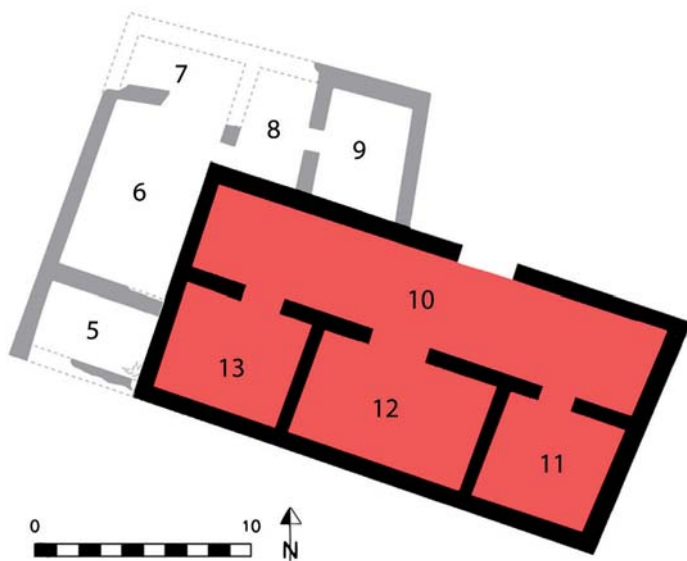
Reconstructed ground plan of the upper storey of the LA house.
